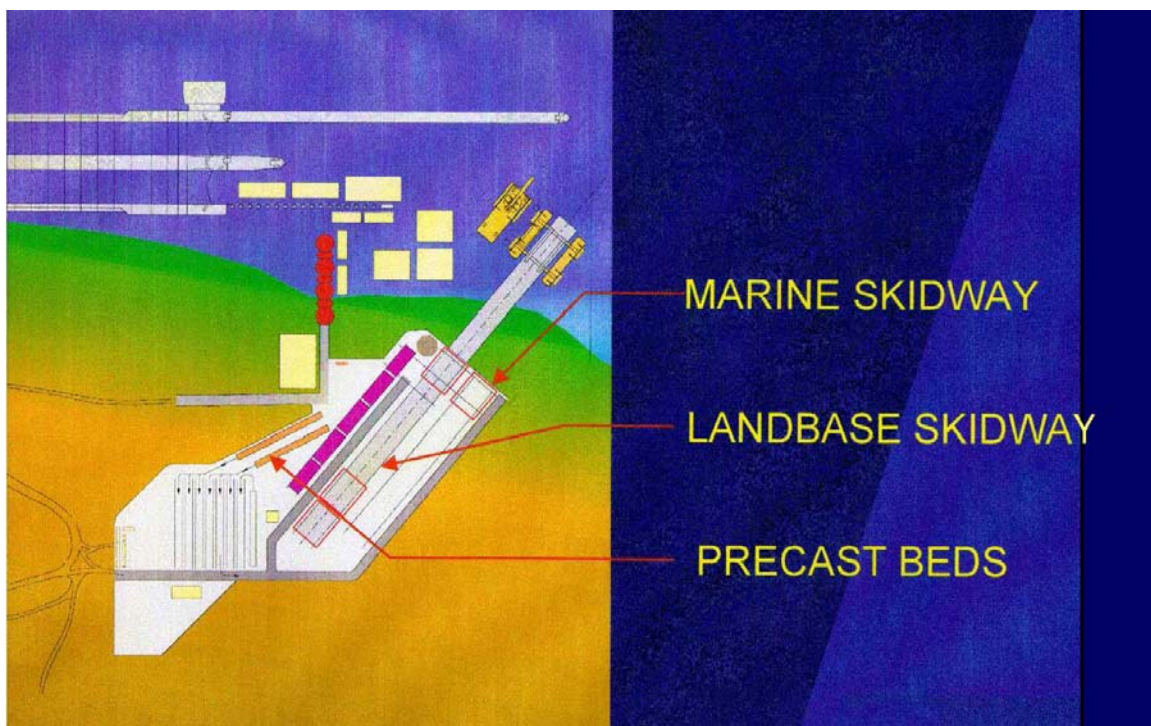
Feasibility level layout of prefabrication facility for Olmsted Dam construction
